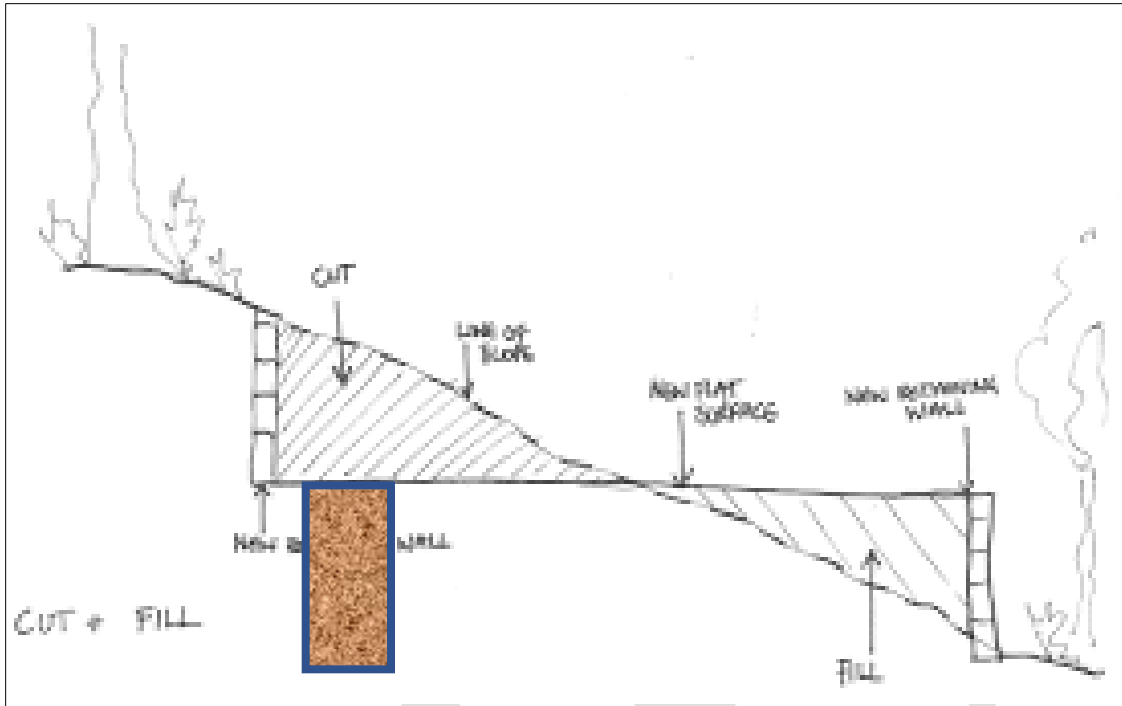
Diagram of a cut and fill road with proposed Project trench shown in brown/blue.
